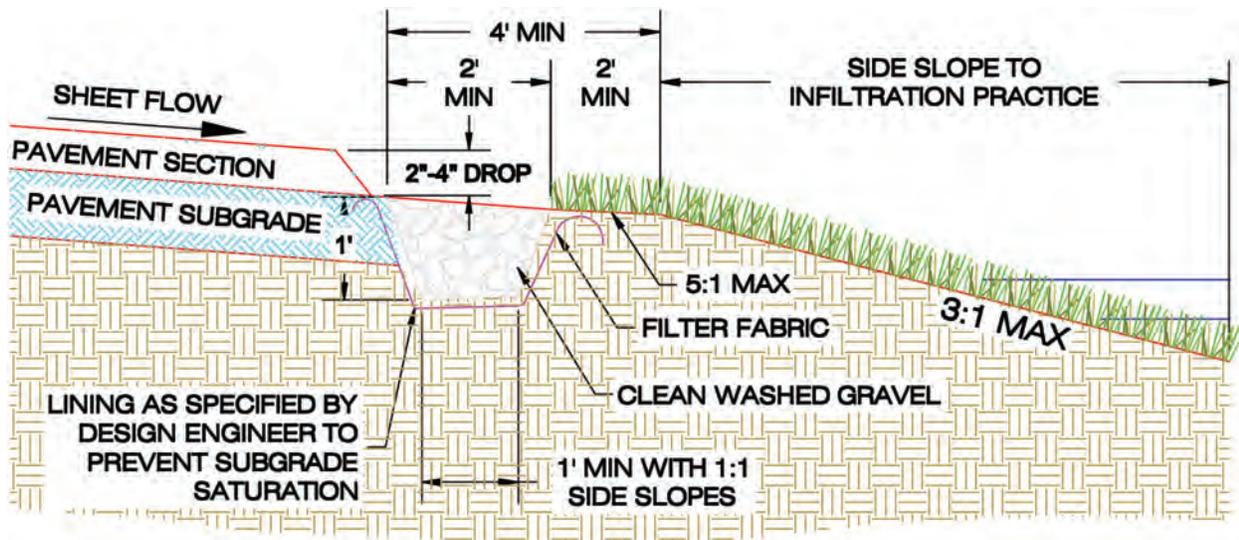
Typical Detail for Pretreatment at Pavement Edge (Source: CWP)
